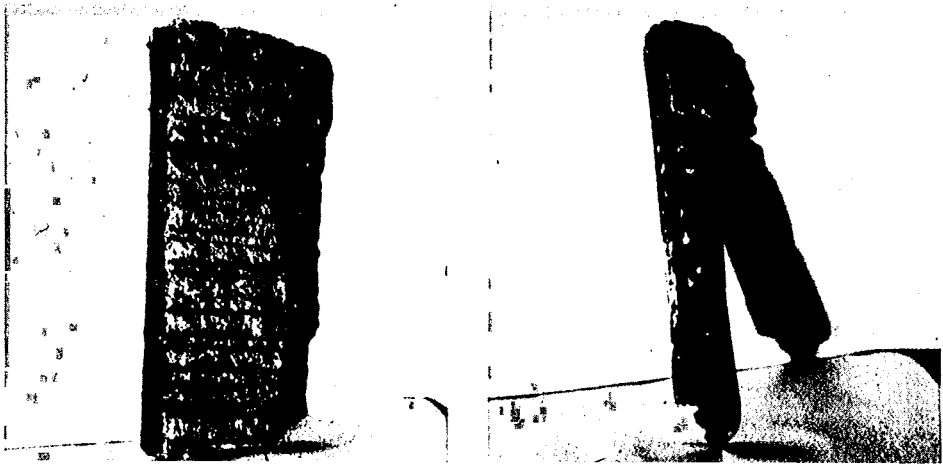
Section of shotcrete cover coat showing products of corrosion at closely spaced wires (left) and almost completely corroded dovetail (right)
